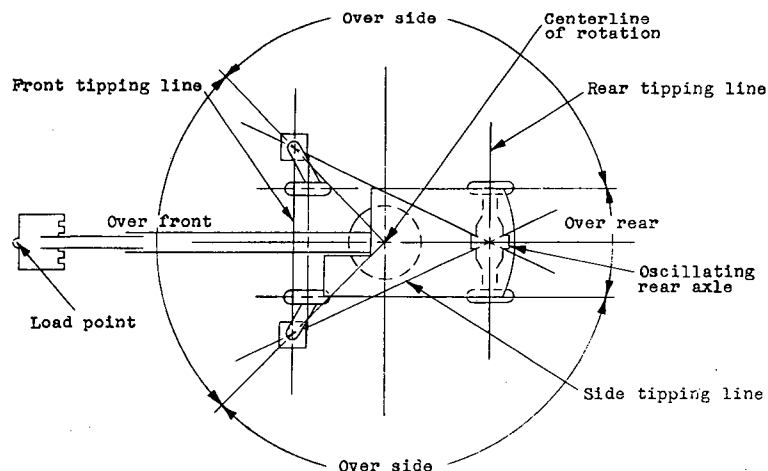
RUBBER-TIRED CARRIER, FRONT OUTRIGGERS, REAR OSCILLATING AXLE
